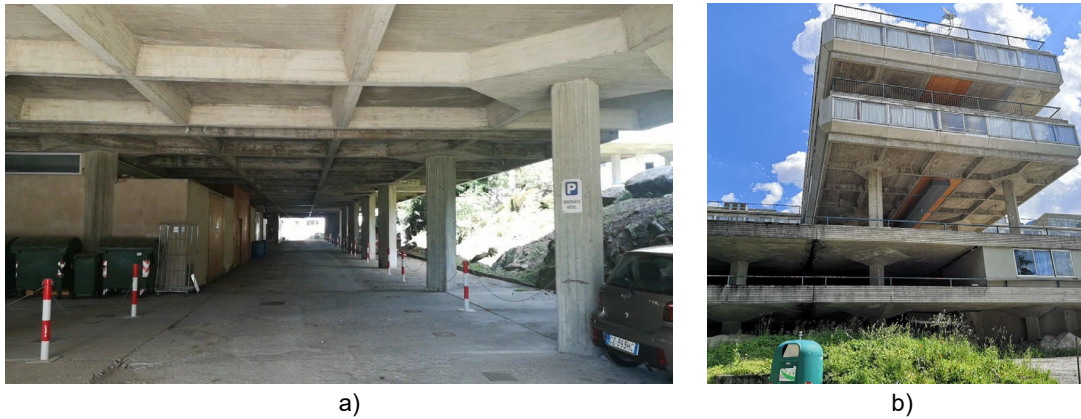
Structural system at study based on waffle slabs supported on square columns - a) view of a typical slab; b) view of a typical building
